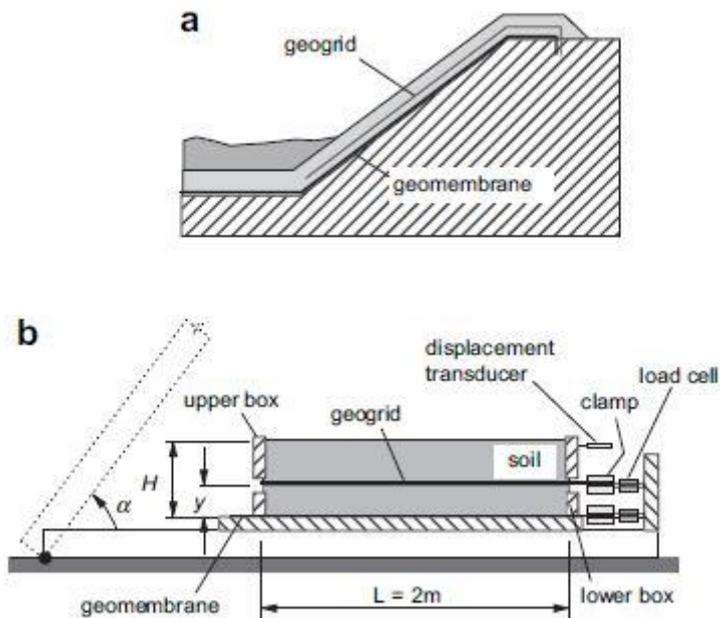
Reinforcement of cover soils of landfills: (a) Situation in site; (b) Ramp test equipment. (Palmeira and Viana, 2003)
